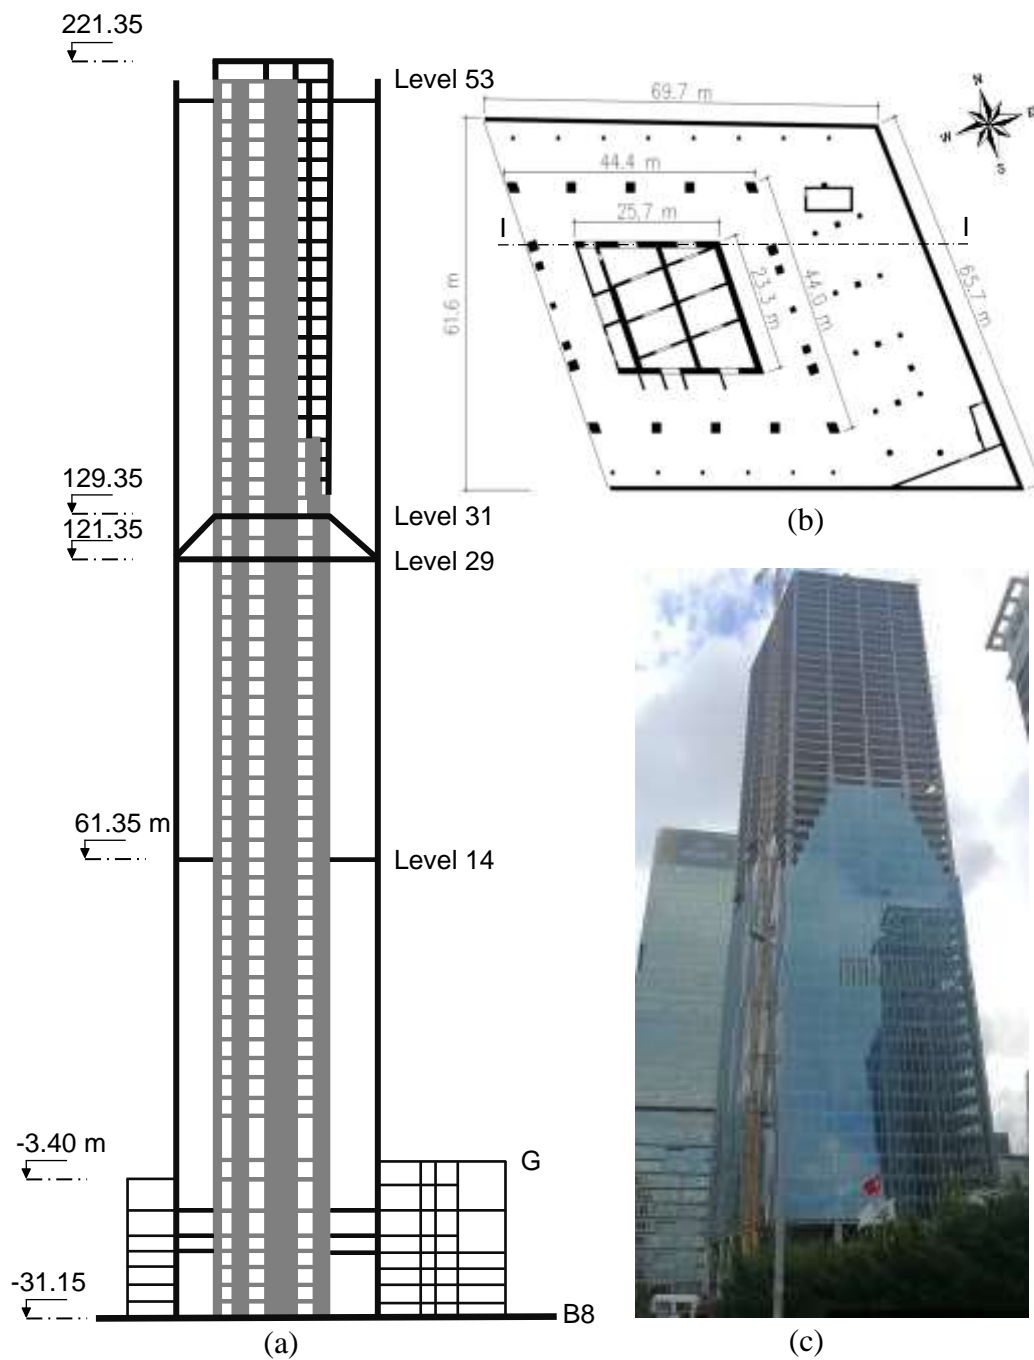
(a) Building section I-I, (b) typical podium floor plan and (c) construction view from the NE corner.
